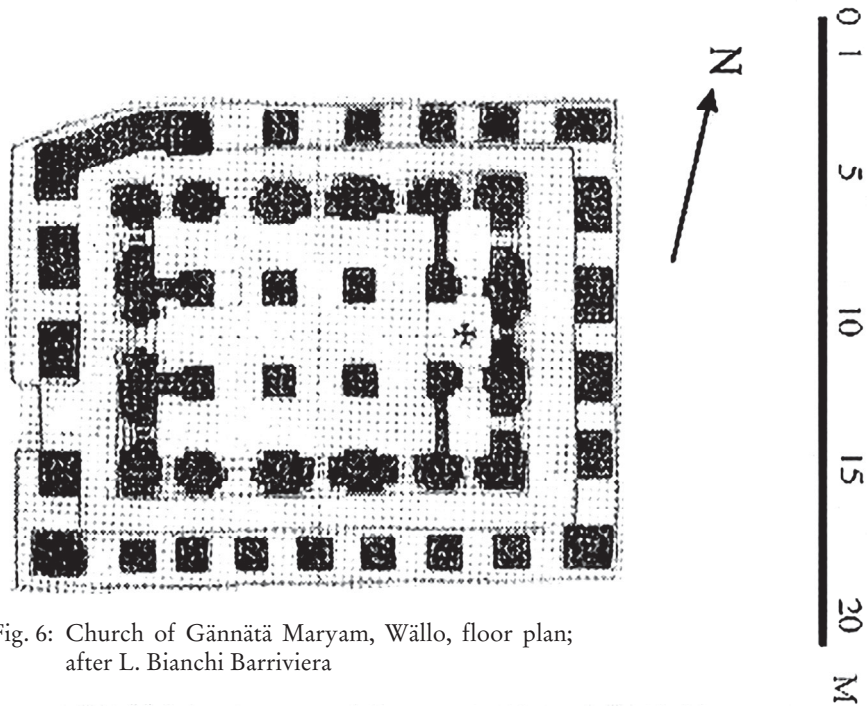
Church of Gännätä Maryam, Wällo, floor plan; after L. Bianchi Barriviera
